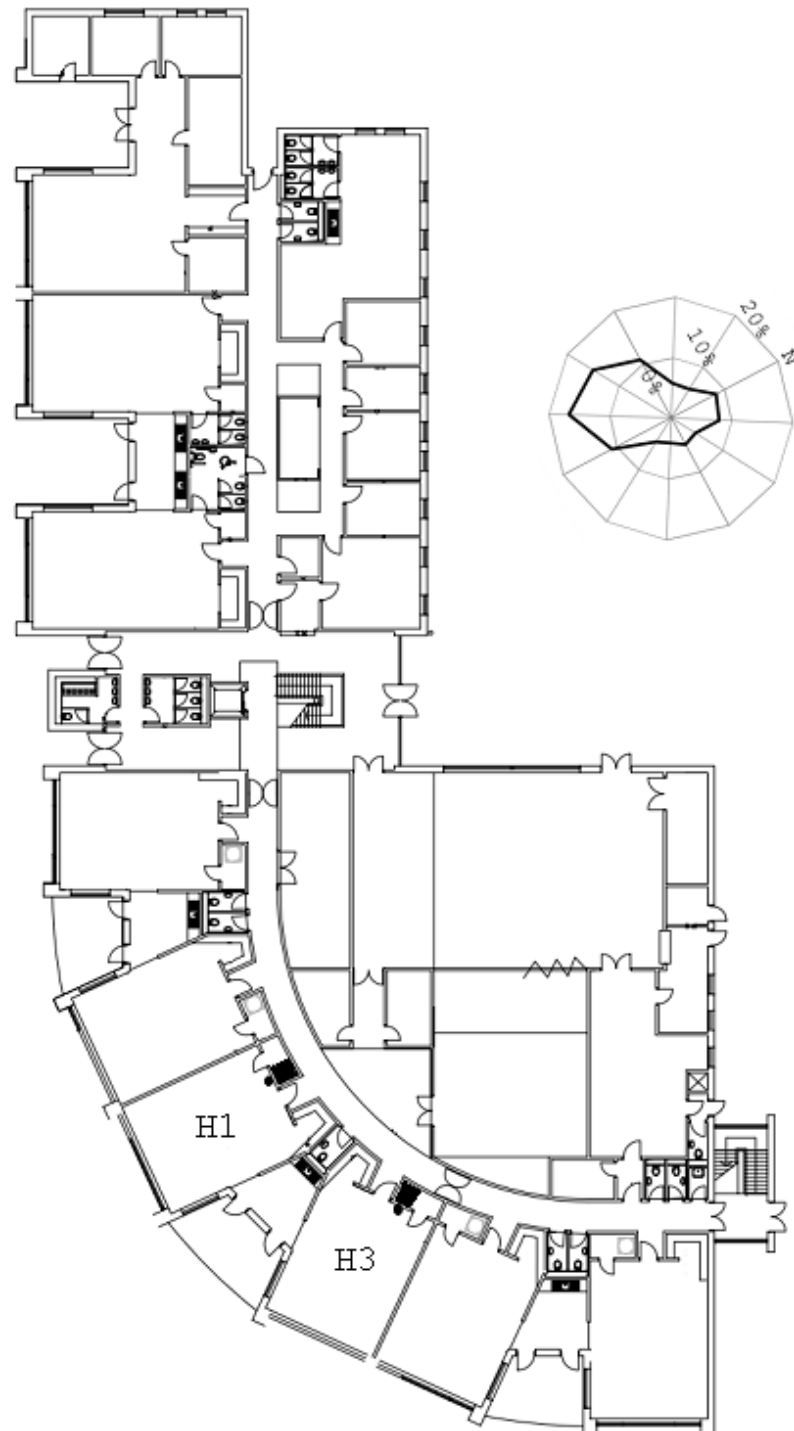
School H, plan view, ground floor. H1 and H3, floor area 52.22 m².
